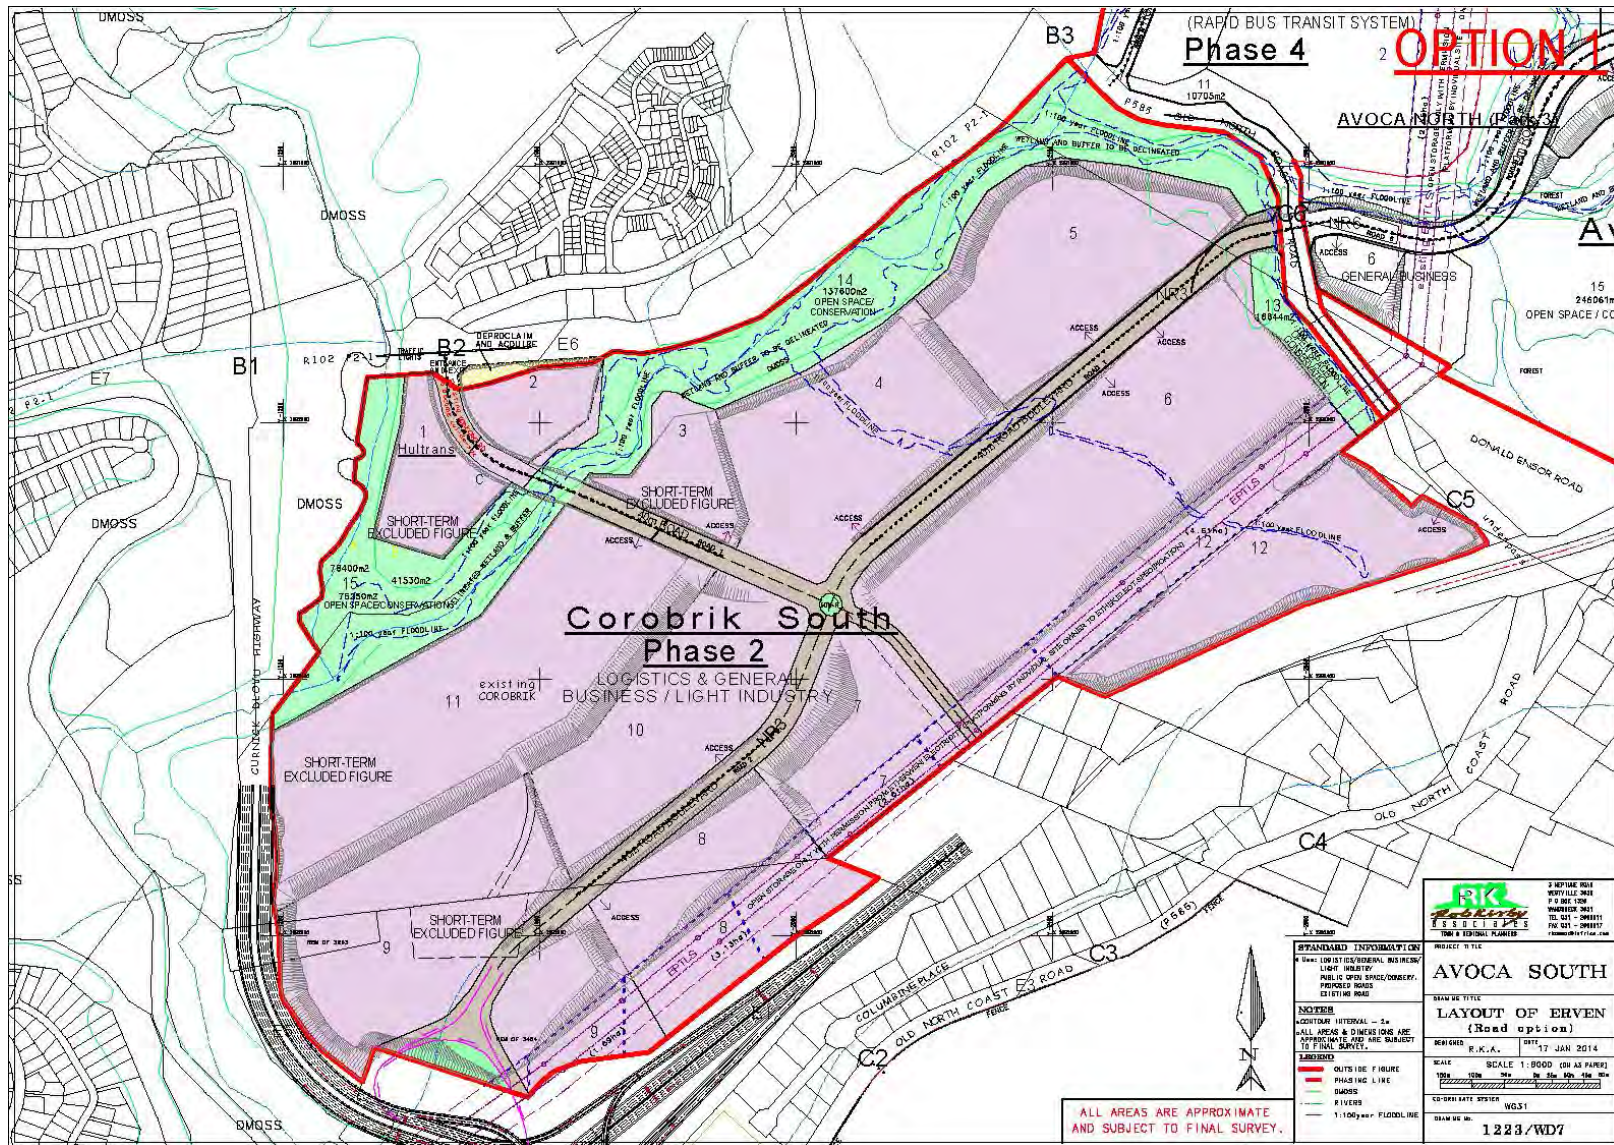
Proposed Layout Option 1 (Drawing No. 1223/WD7)
